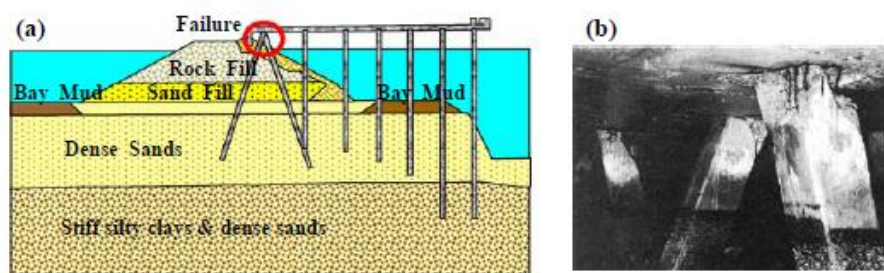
7th Street terminal, Oakland, after the Loma Prieta earthquake: (a) cross section, (b) damage to batter piles
